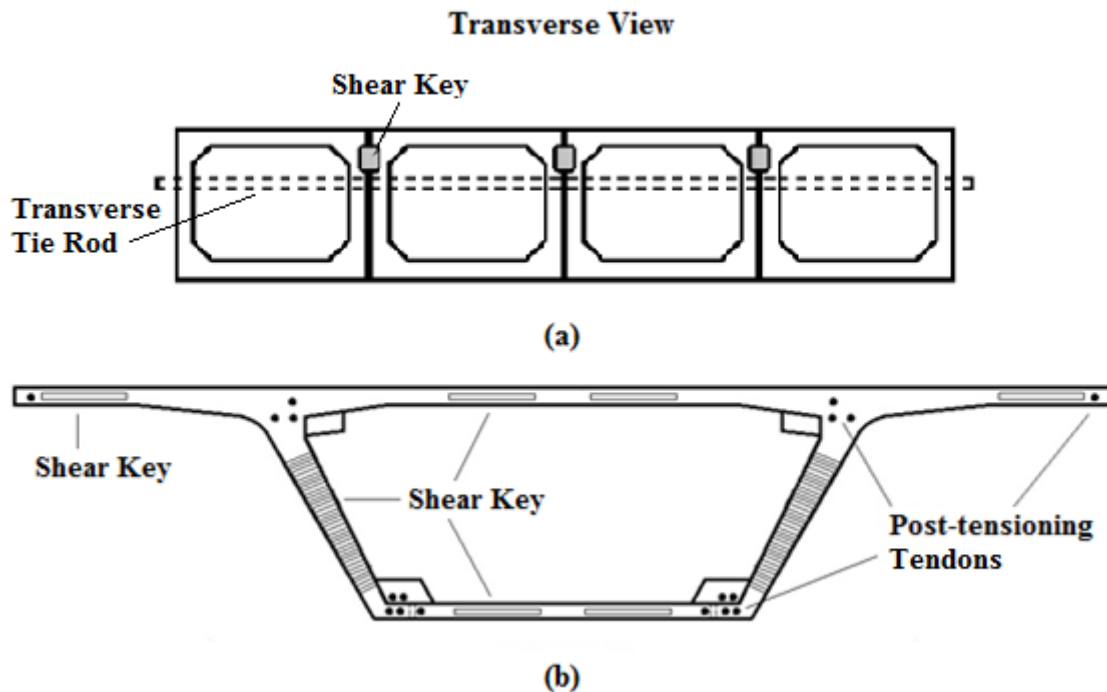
Concrete Box Girders: (a) Adjacent (b) Segmental
